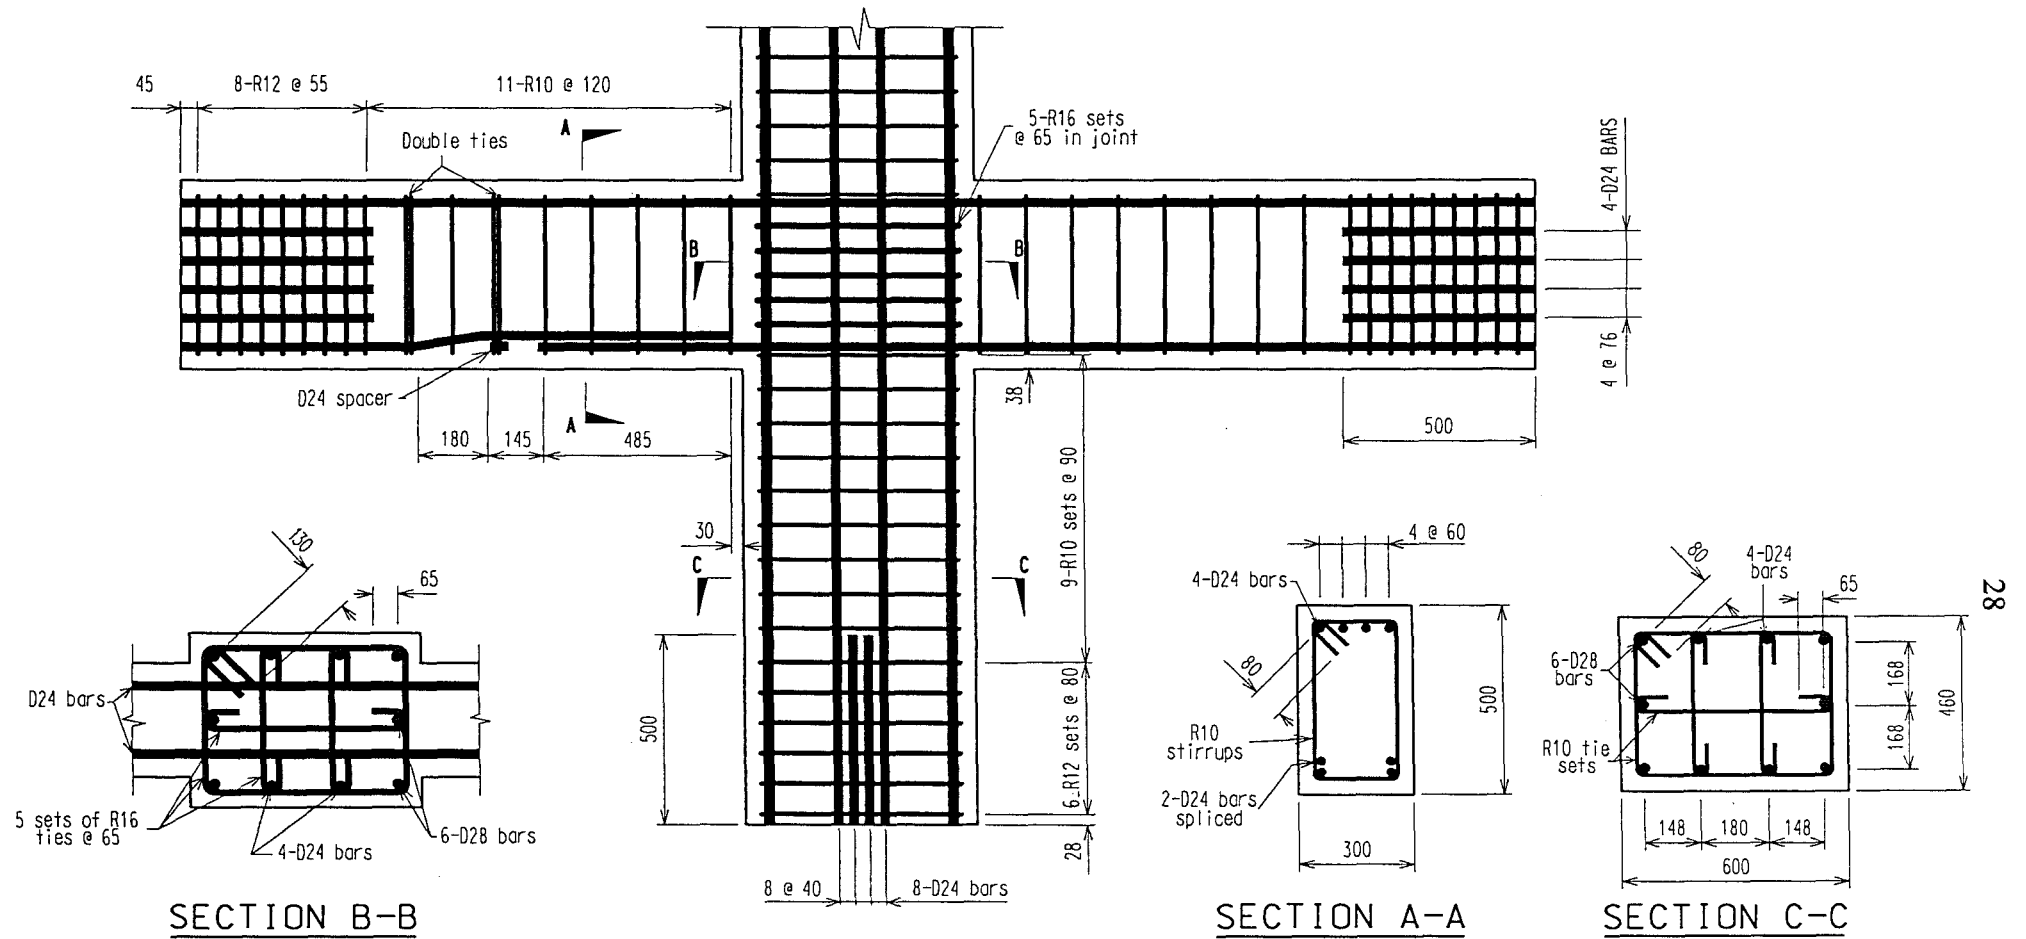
Beam-Column Detail of an Exterior Frame from an Existing Building
